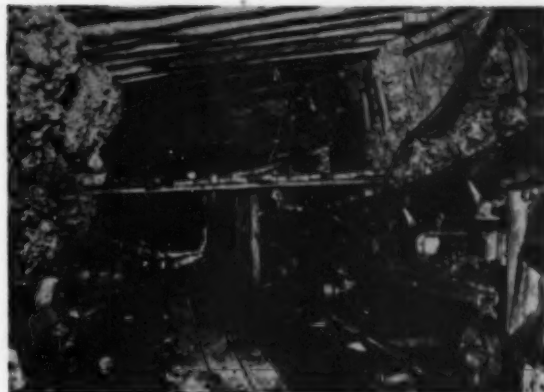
View of roof-bolted back brushing 250 ft from face. Side bolts and a section of the Sydney Mines gate belt loader are also shown.
